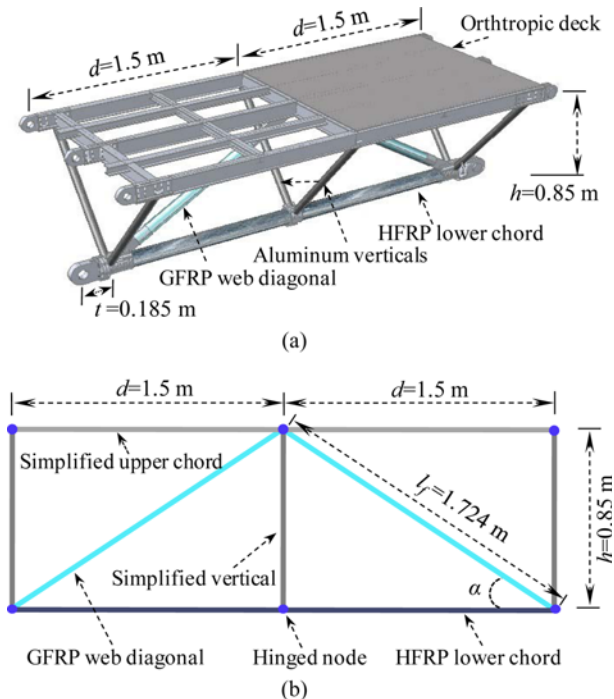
Simplification of the Hybrid Spatial Deck–truss Structure into a Planar Truss Model: (a) Original Spatial Structure, (b) Simplified Planar Truss Model
